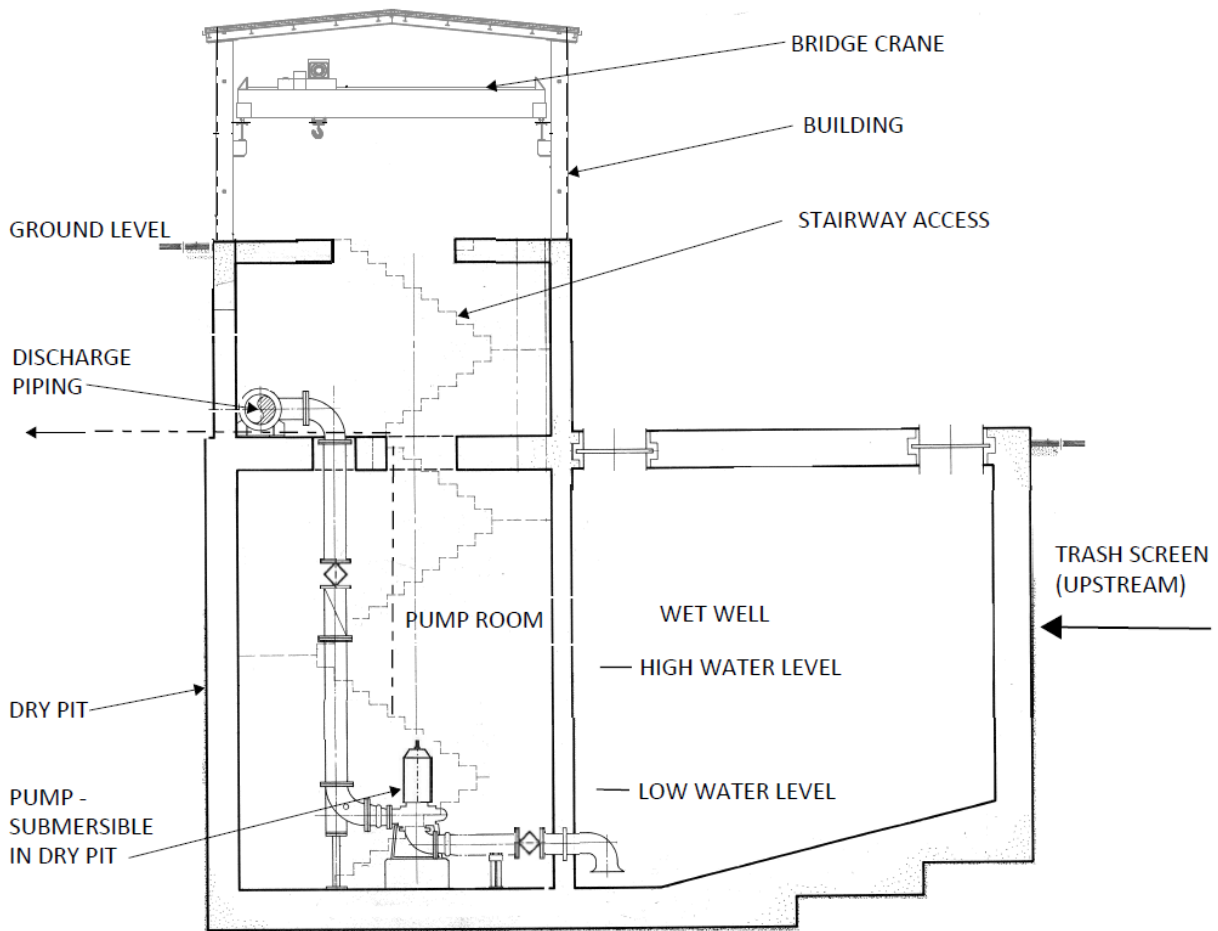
Example of Submersible Pump Dry Pit Pump Station
